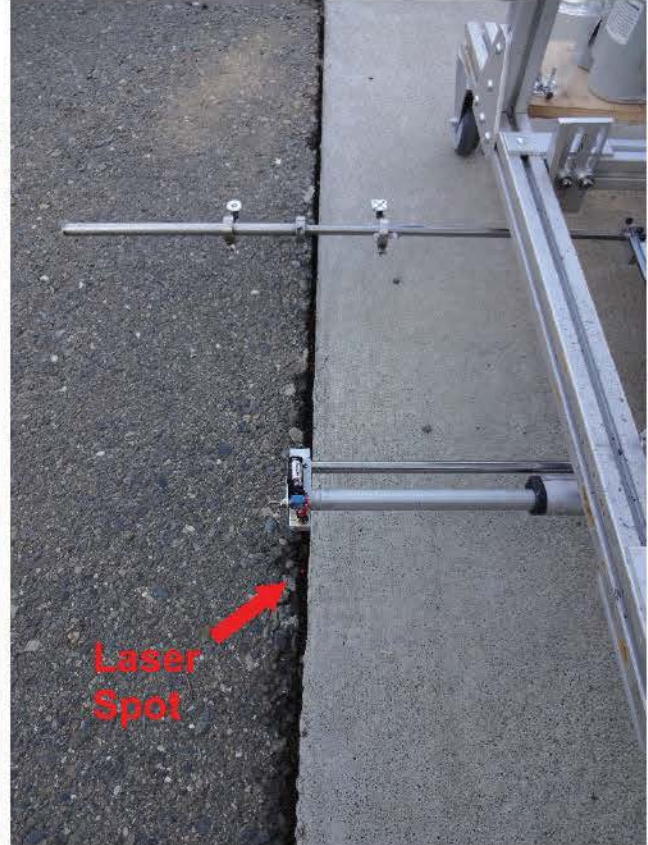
Laboratory Testing of a Longitudinal Crack Photograph
